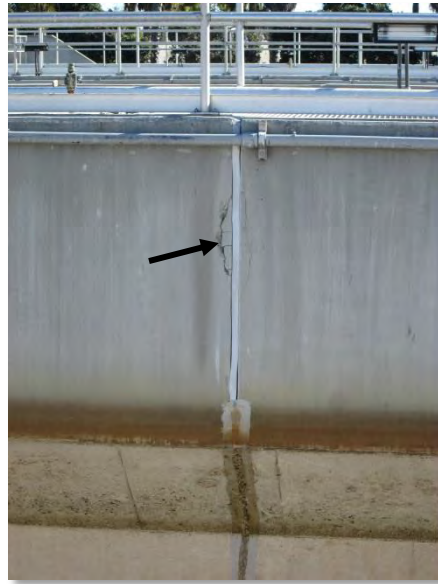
Spalling concrete adjacent to expansion joint.
